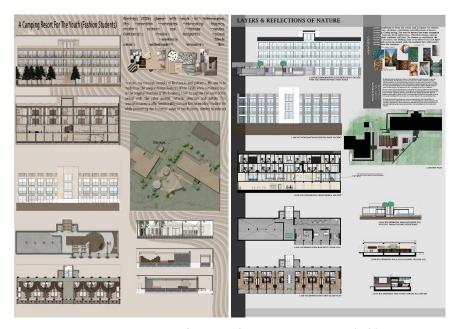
1:200 site plan and 1:100 plans and facades of the Fashinnovation (left) and Layer+reflection (right) projects (IAED, 2023)
